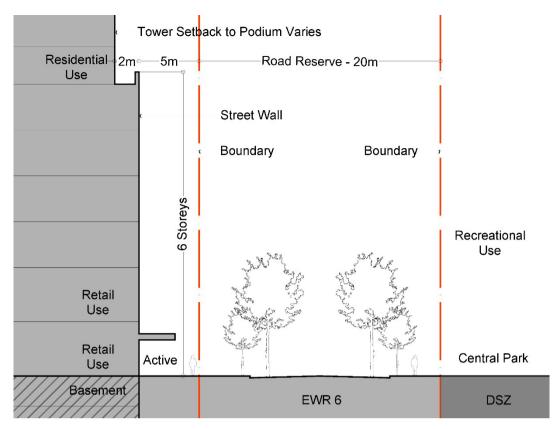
Street Wall Height in Town Centre
